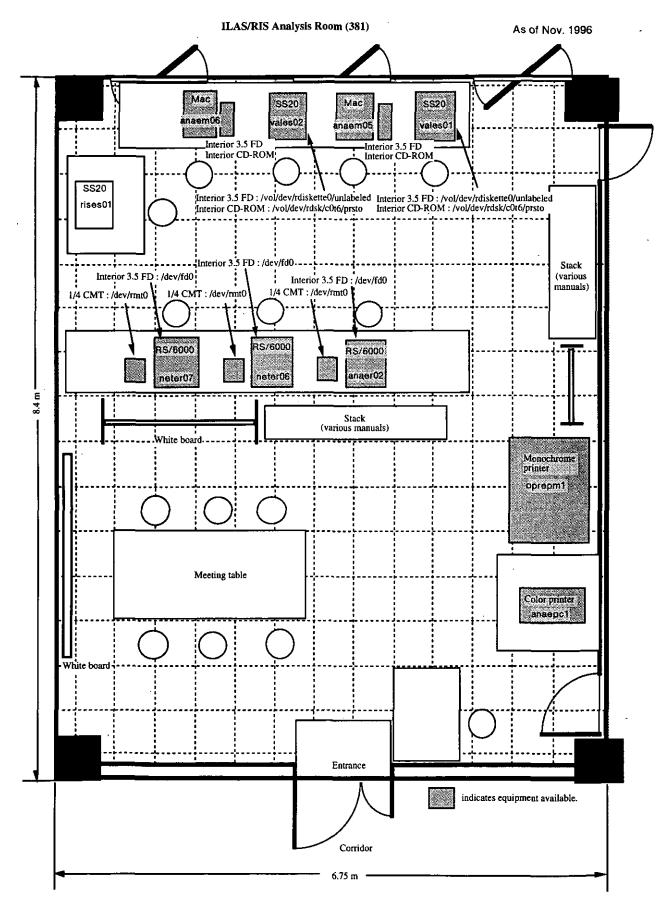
Layout of Analysis Room of ILAS & RIS DHF, 3rd Floor of Main Research Building III
